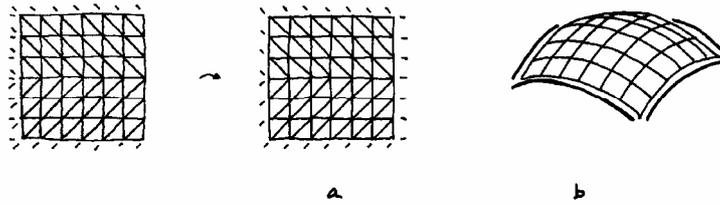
Vertical supported translation faceted elliptic paraboloid. a) The translation truss system. b) The faceted translation shell.
